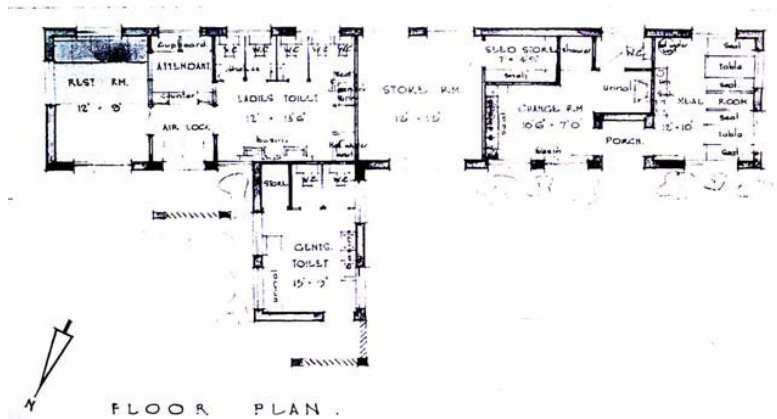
Plan of the public toilet/convenience block and storeroom built in the park in the early 1950s. Source: Sydney City Council Archives.
